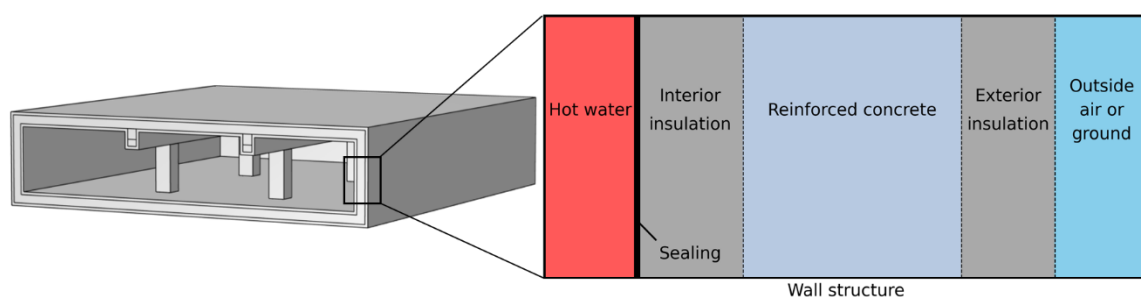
Left: Sectional view of the 3D model of the cellar, right: Wall structure after transformation from concrete wall to heat storage [Source: iwe]
